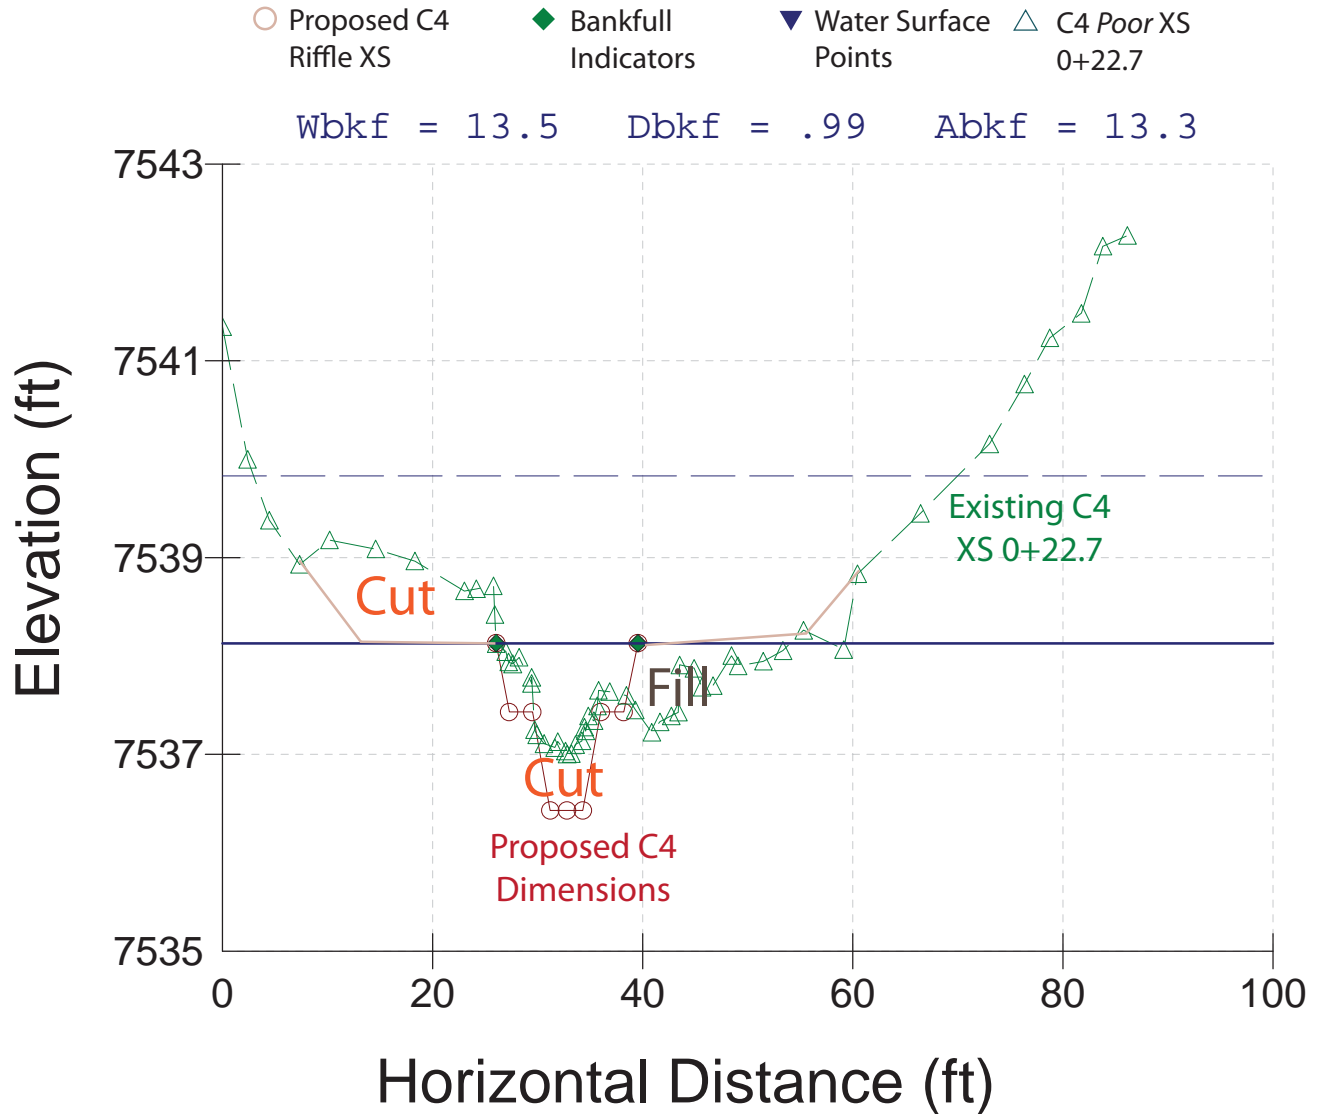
The proposed C4 Stable riffle cross-section compared to the existing C4 Poor cross-section 0+27 showing the cut and fill recommendations and reconnecting the channel with the floodplain.
